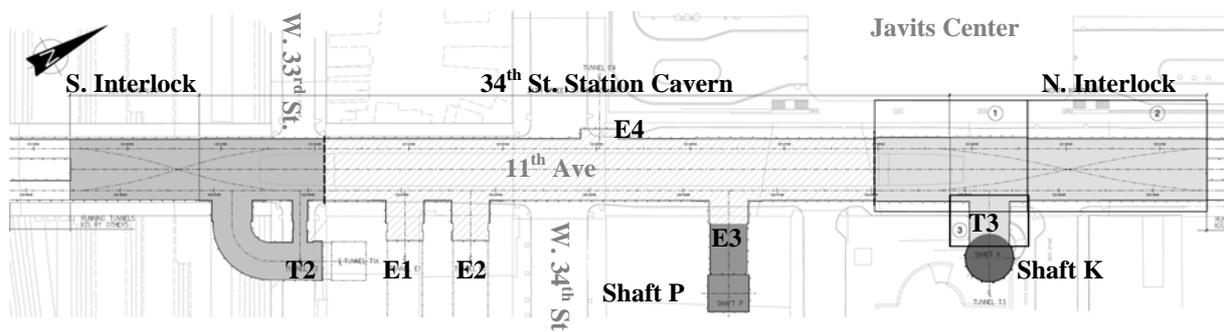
Plan view of 34th Street Station cavern along 11th Avenue showing the penetrations for future entrance development. Primary construction access was through Shaft P.
